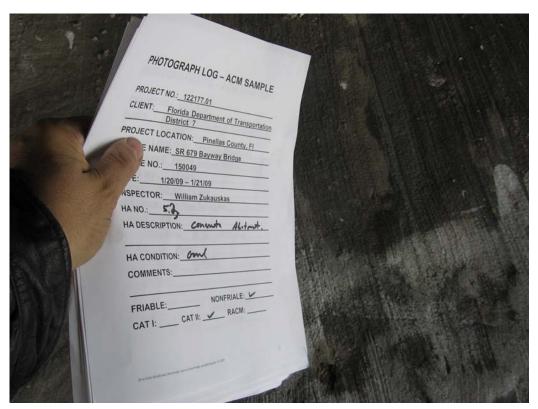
01/21/09 - SAMPLE 5.3 - HA 5 CONCRETE ABUTMENT WALLS
